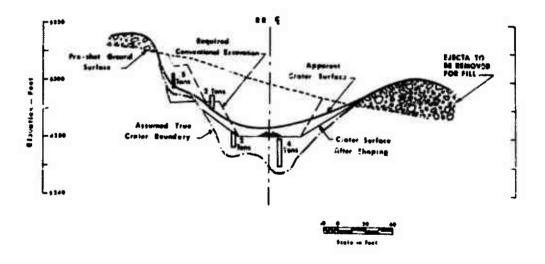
Design for typical cross section of Trinidad railroad cut RR-3.
